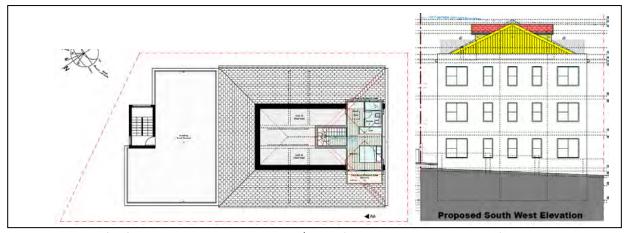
Plans of refused proposal under DA-422/2021. (Source: iSA Designs, 2019)
